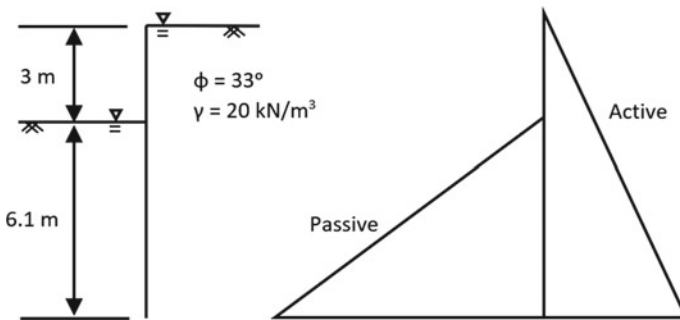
Cross-section of embedded retaining wall with lateral earth pressure diagram
